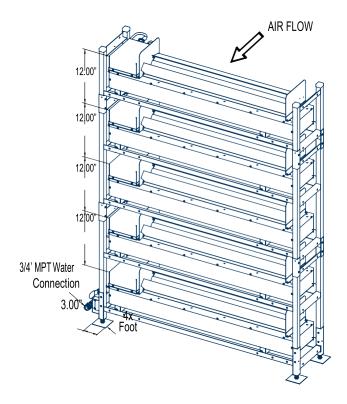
Humidifier Mounting Rack Front View with five Humidifiers
